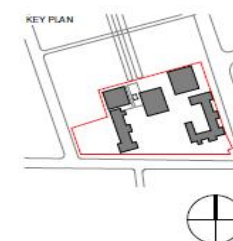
Proposed site plan – Centennial Avenue (Source: Architectus)
